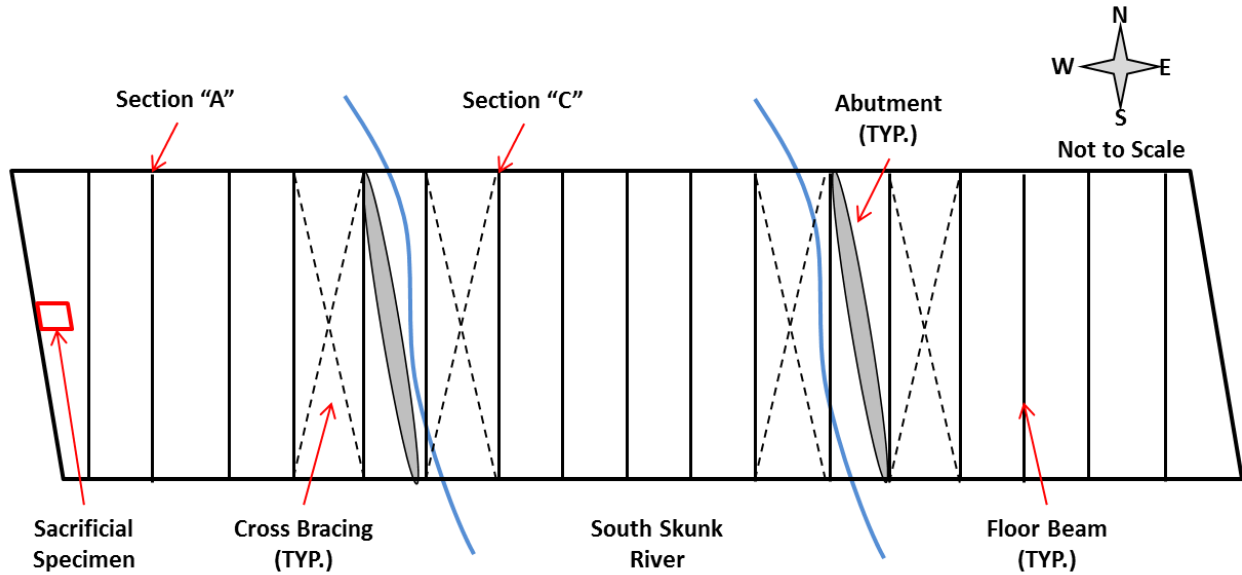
Schematic layout of south span of US 30 bridge depicting locations of field experiments
